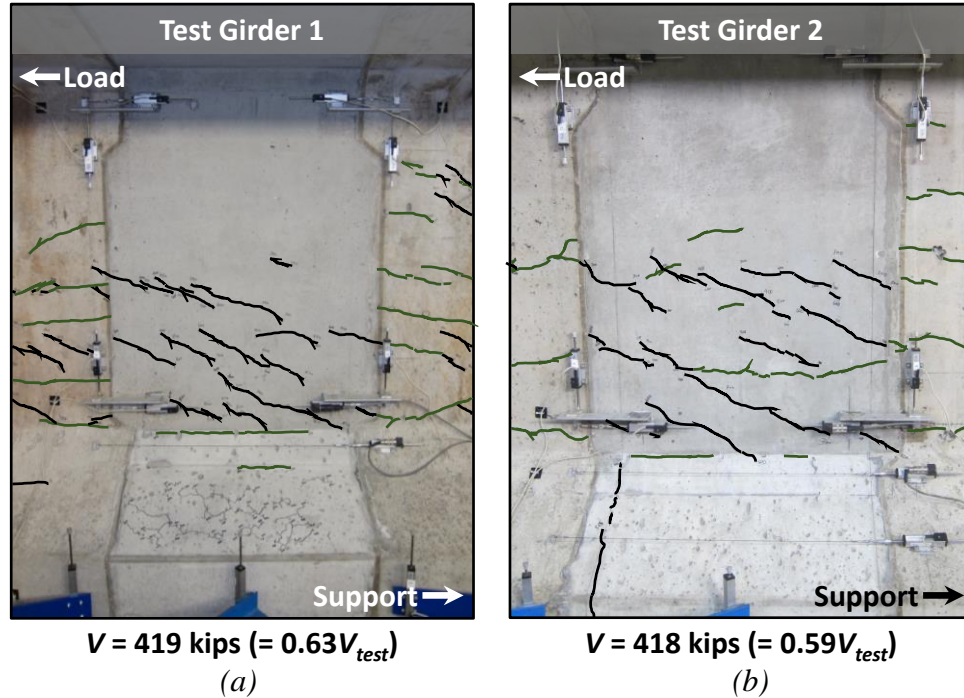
Distribution of cracks within the splice region – (a) Test Girder 1; (b) Test Girder 2
